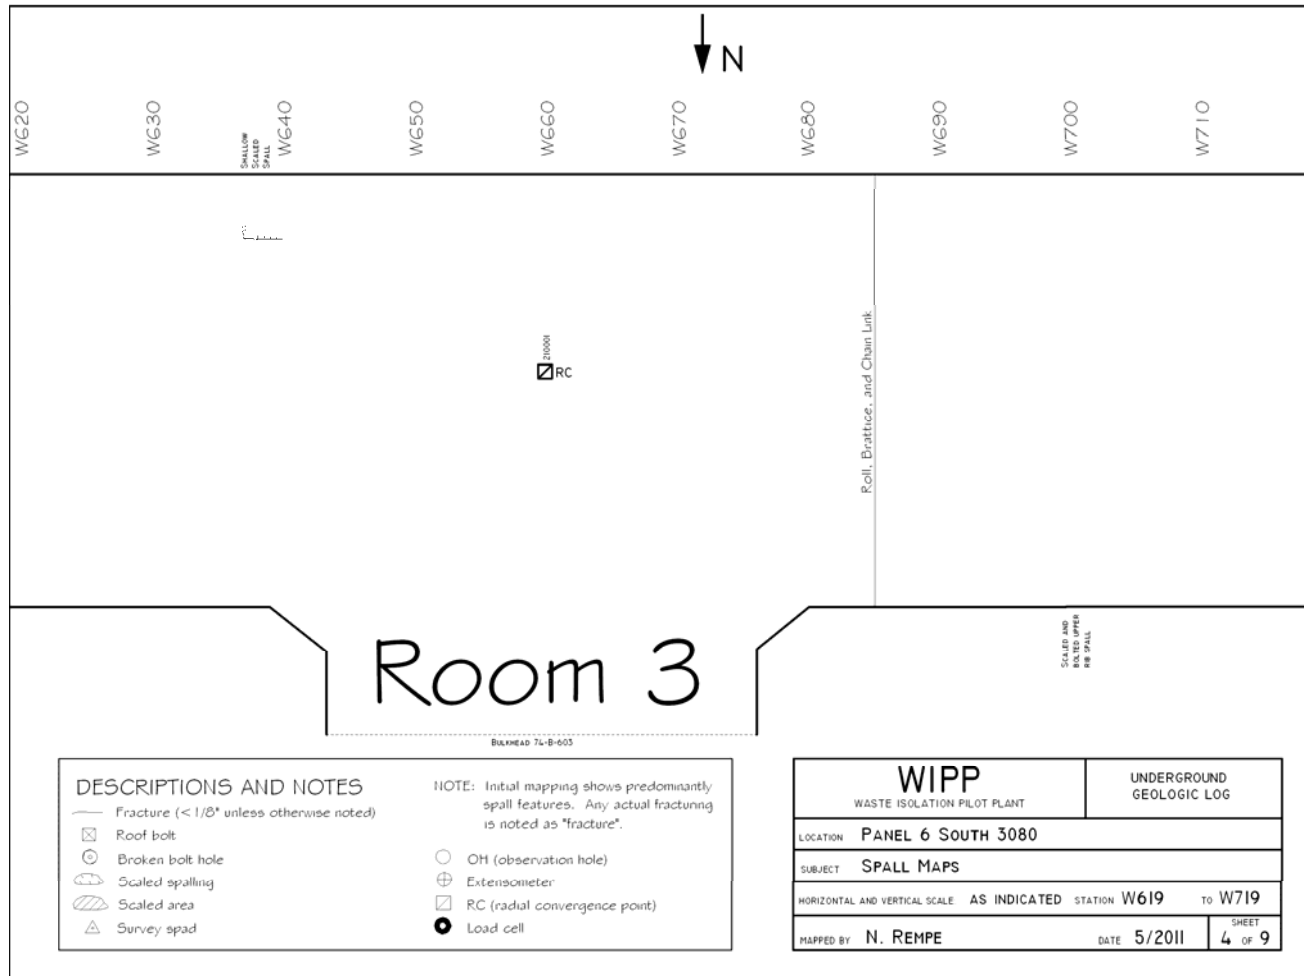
Panel 6 S3080, W390-W1210 Roof Fractures (Sheet 4 of 9)
